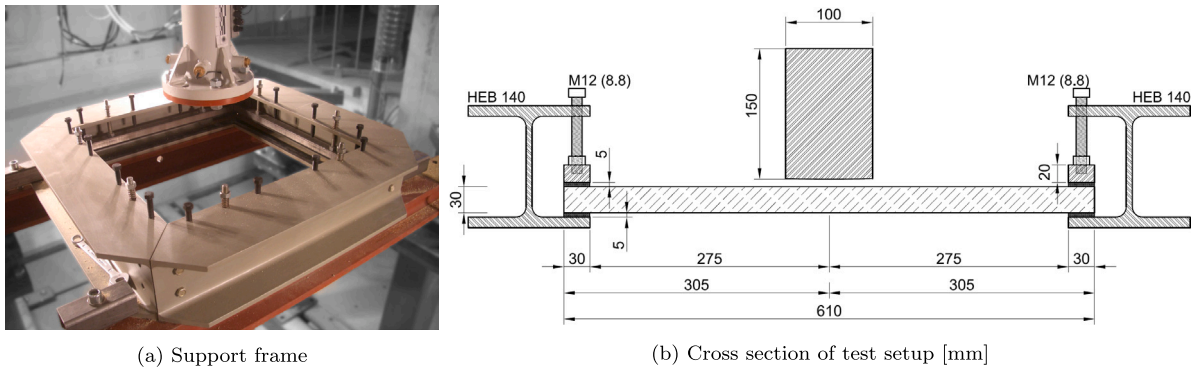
(a) Test set-up for impact tests and (b) a schematic view of the clamping configuration [53].
